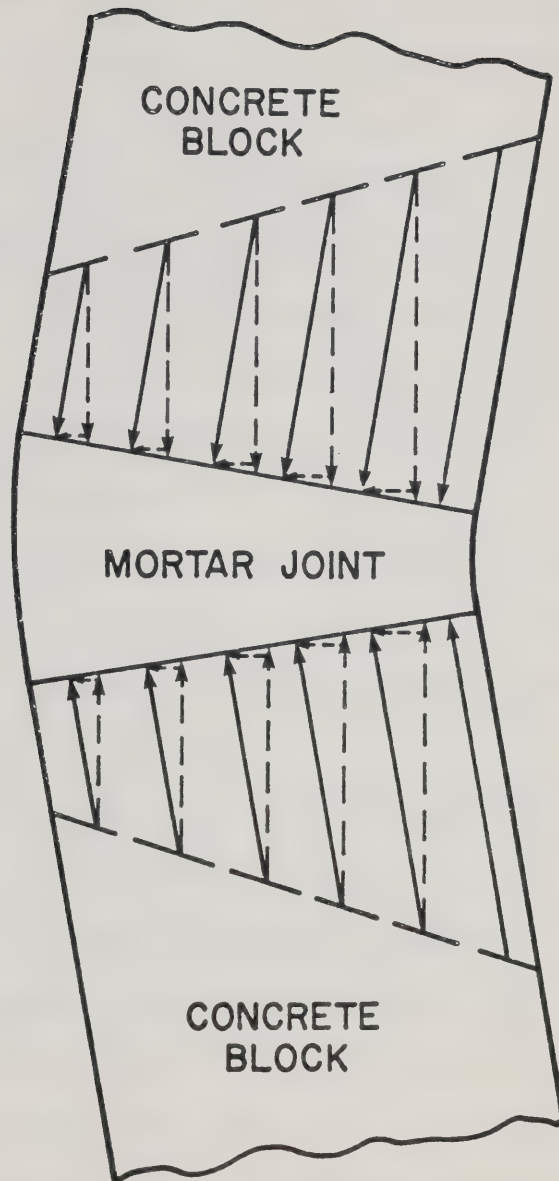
Forces Acting on Eccentrically Loaded Wall Segment
